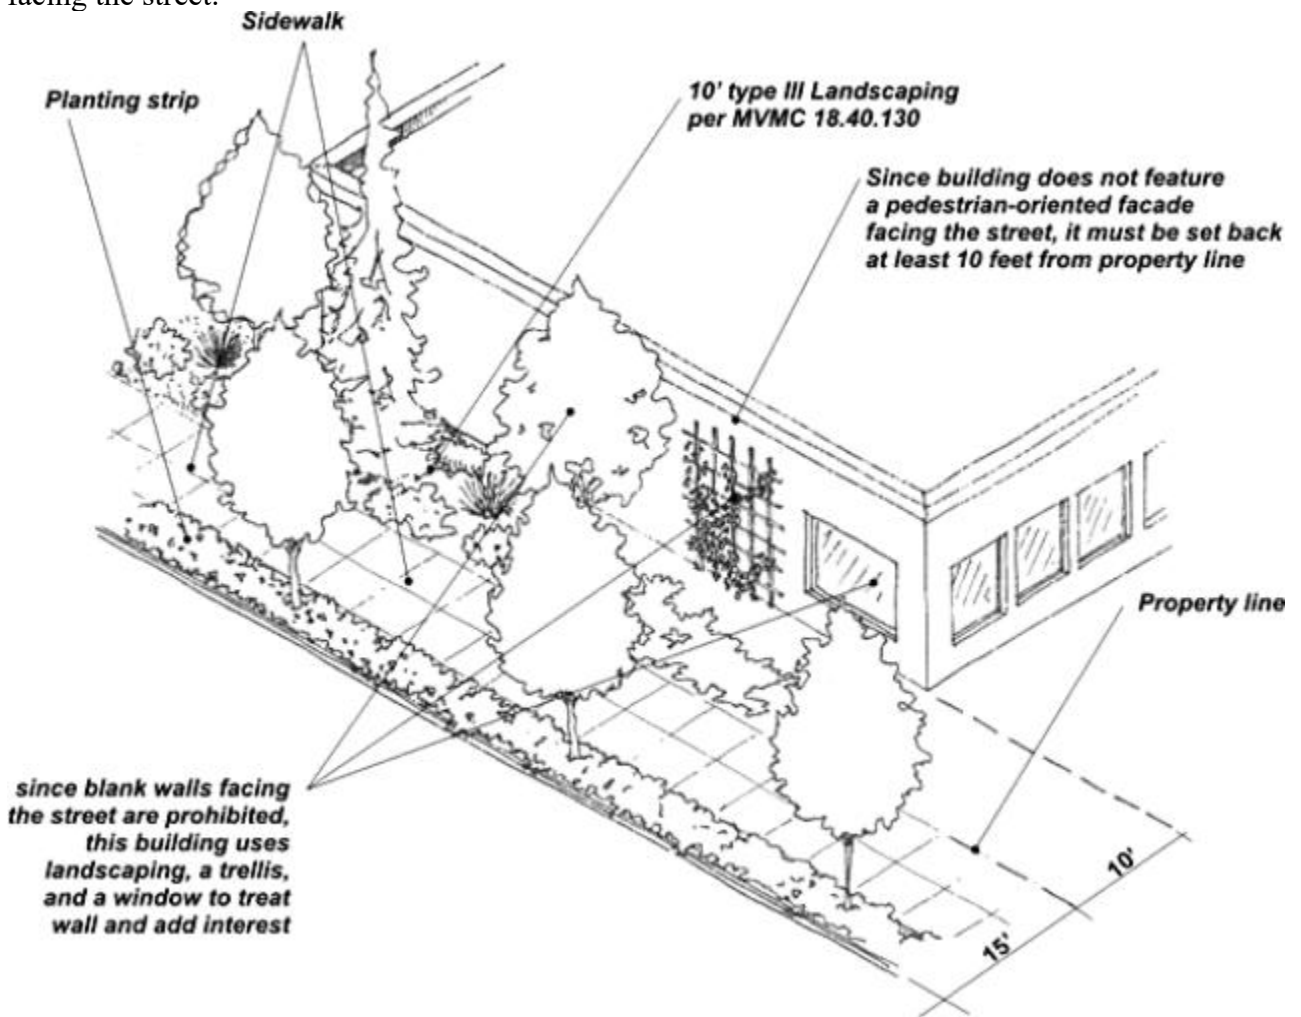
Illustrating the requirement for a 10-foot buffer of Type III landscaping between the street and any building that does not contain a pedestrian-oriented building facade
